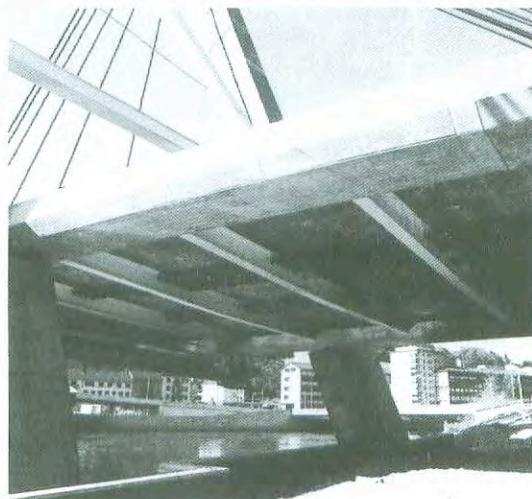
Example of a concrete deck with steel crossbeams –Rheinbrücke N4 Cable stayed bridge – Schaffhausen, Switzerland [6.1]
